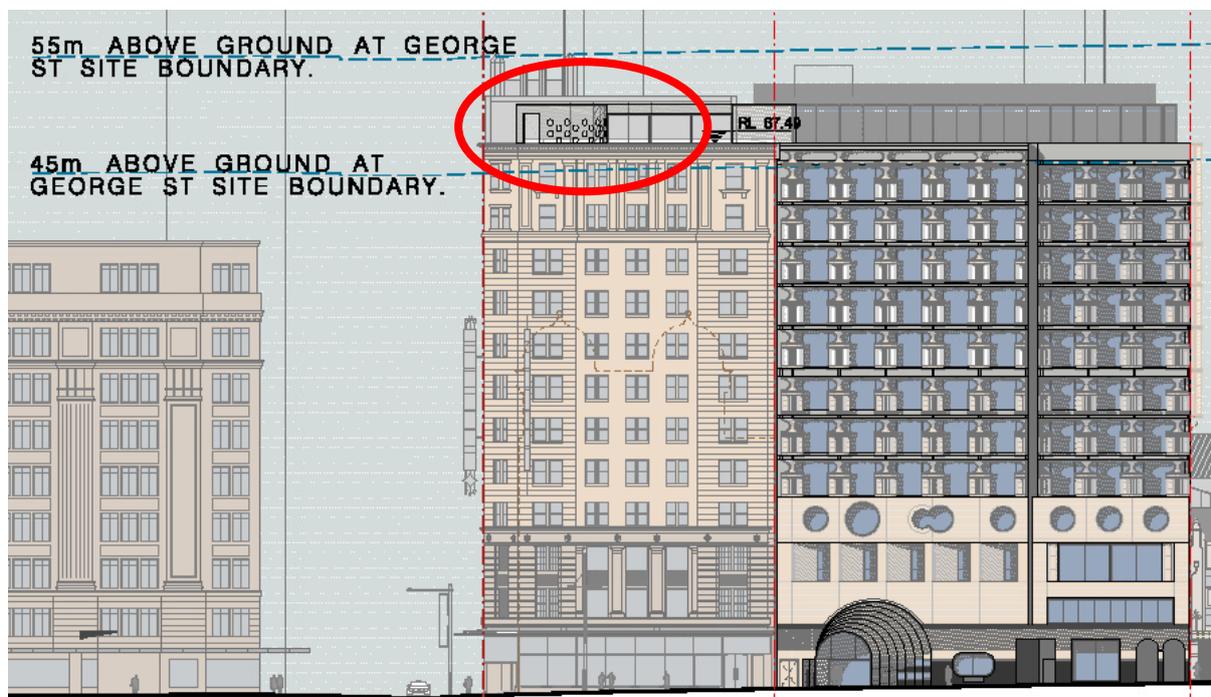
Extract of the George St elevation with the rooftop addition circled in red
